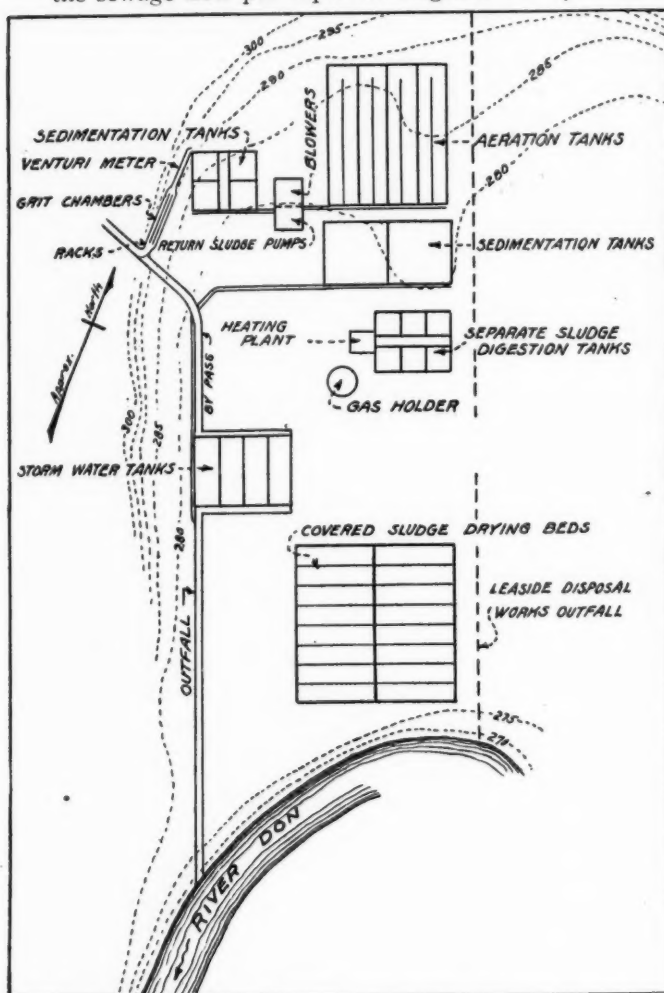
GENERAL LAY-OUT OF PLANT, PROJECT III.
